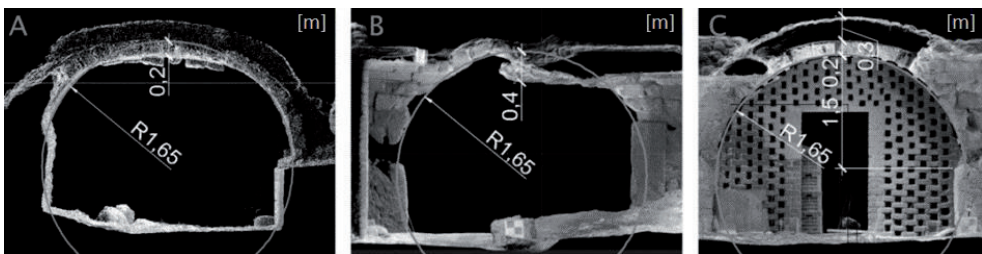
Laser scanning images: cross-section 1-1 (A); cross-section 2-2 (B); cross-section 3-3 (C)
